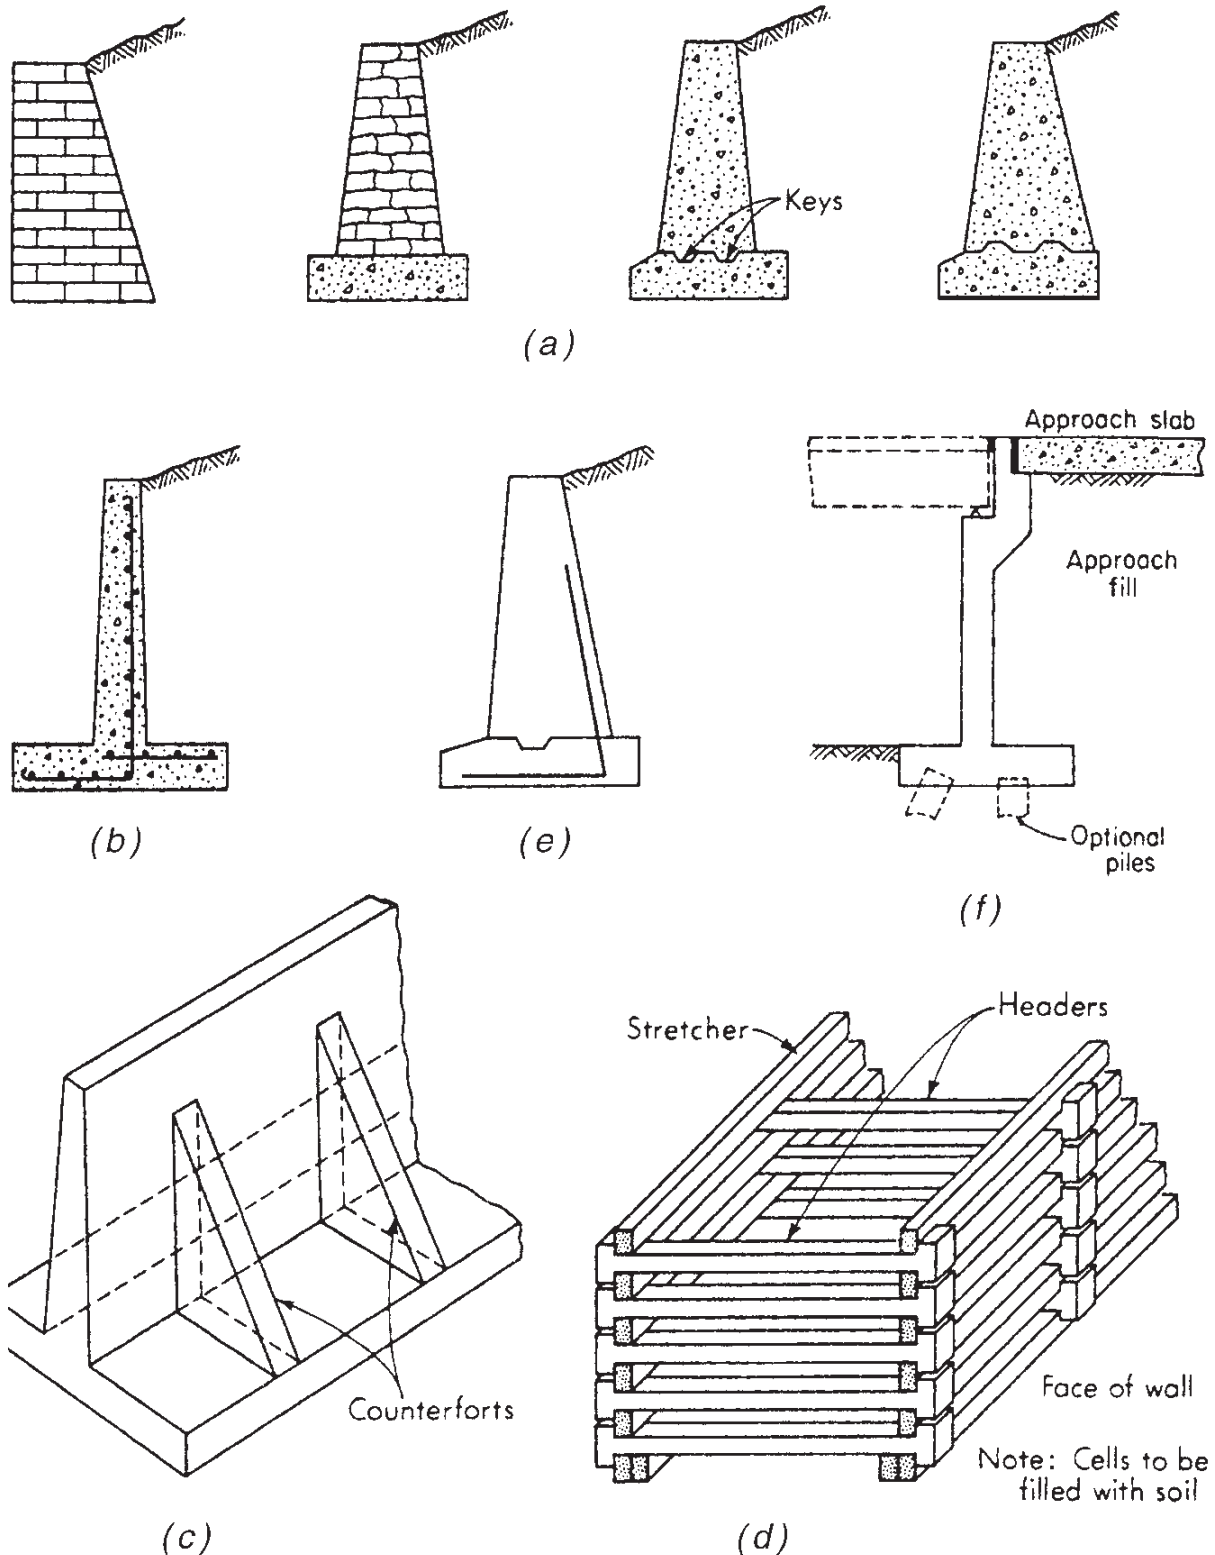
Common types of retaining walls. (a) Gravity walls of stone, brick, or plain concrete. Weight provides overturning and sliding stability. (b) Cantilevered wall. (c) Counterfort, or buttressed wall. If backfill covers counterforts, the wall is termed a *counterfort*. (d) Crib wall. (e) Semigravity wall (often steel reinforcement is used). (f) Bridge abutment. (Reproduced from Bowles 1982 with permission of McGraw-Hill, Inc.)
